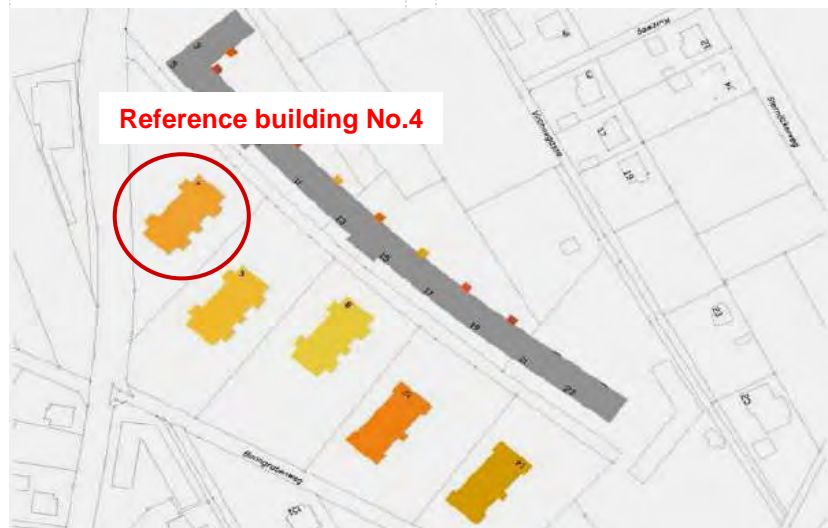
Site plan of the entire area and the specific position of the building “Dieselweg No. 4” [Source: Hohensinn ZT GmbH]
